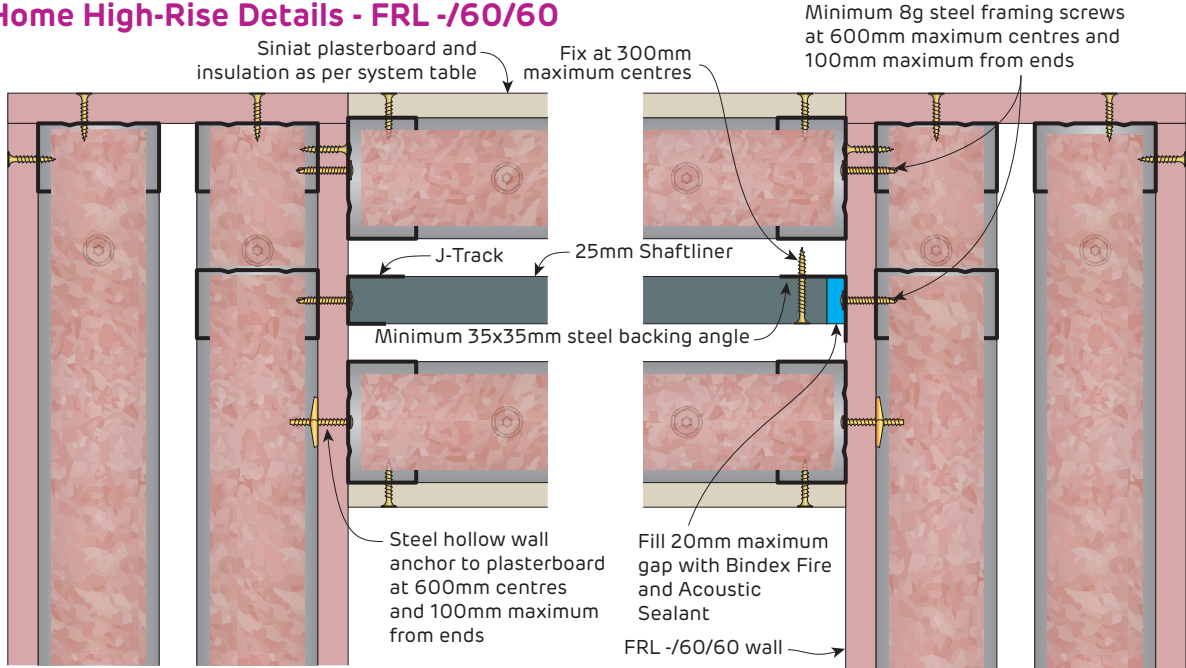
InterHome High-Rise Wall Connection to Fire Rated Plasterboard Wall Plan
